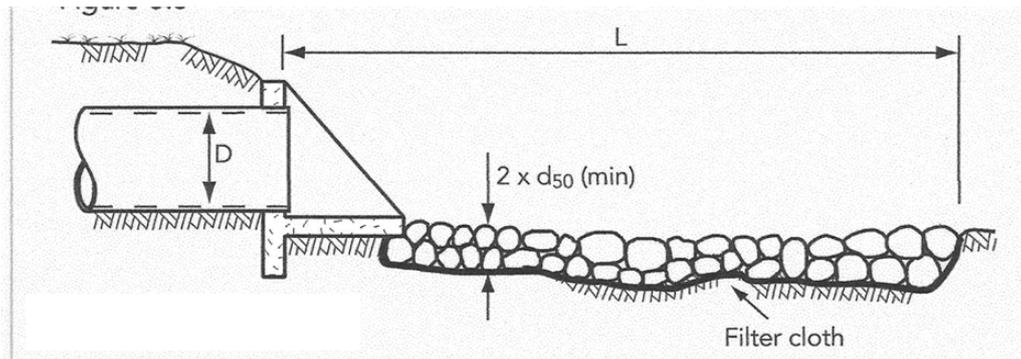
long section of pipe outlet and rock pad (from BCC, 2003).
